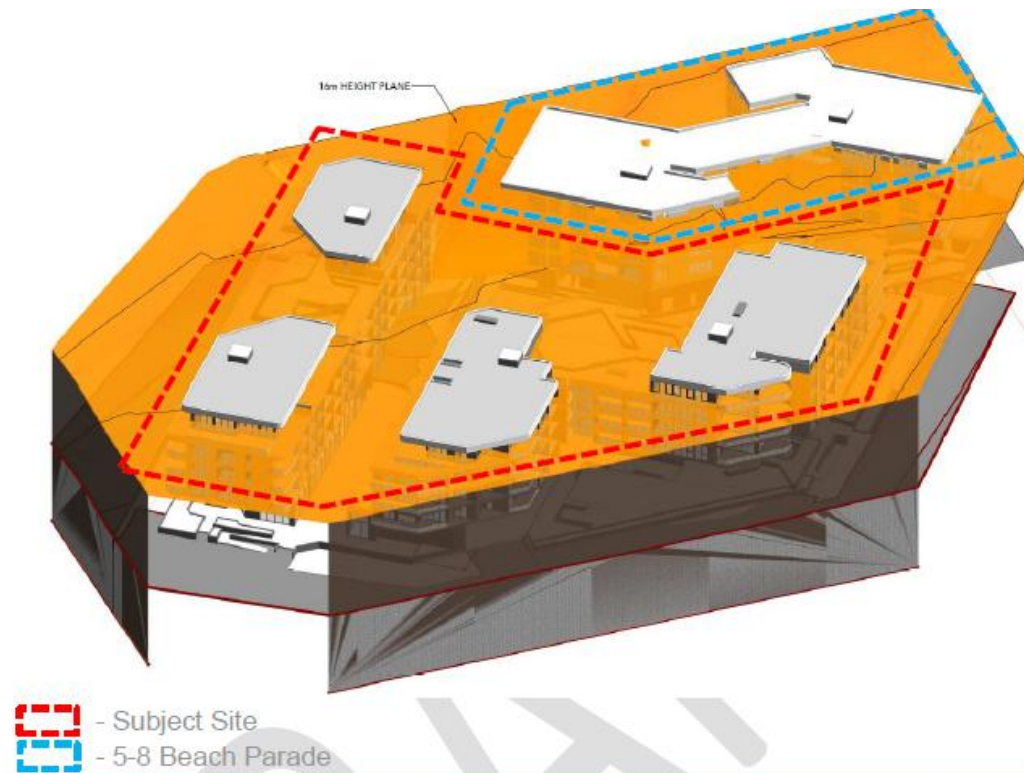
Team 2 Architects 3D Height Plane showing the subject site (Site 1 and Site 2) and Site O (5-8 Beach Parade) (Source: Think Planners)
